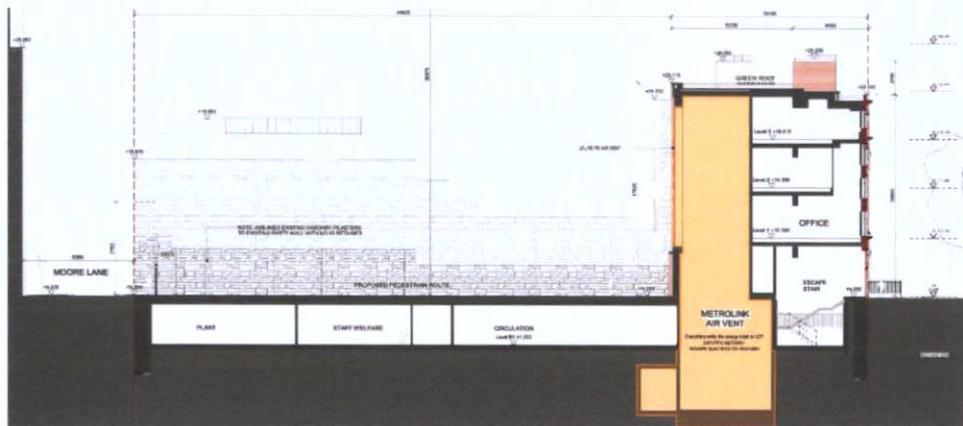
Section, facing towards north boundary wall between Nos.42 and 43 O'Connell Street Upper
